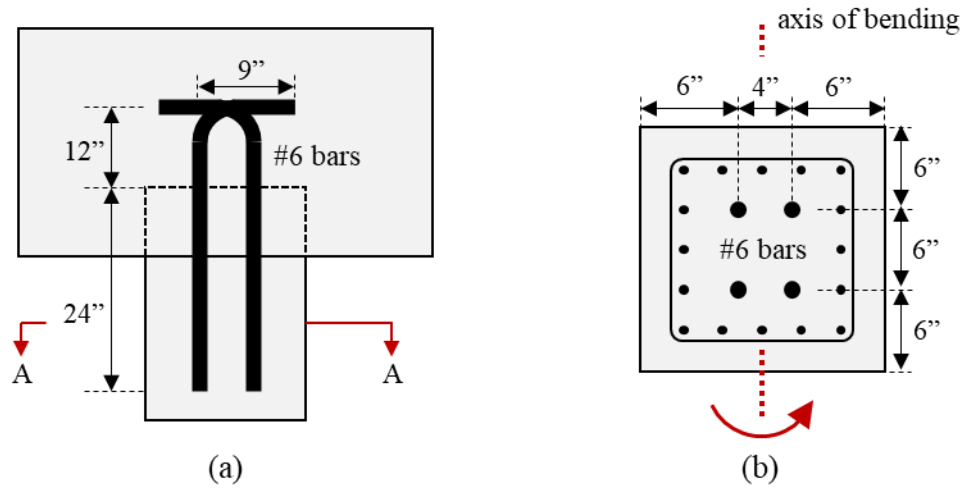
Details of interface reinforcement for SP-03, (a) elevation and (b) Section A-A
